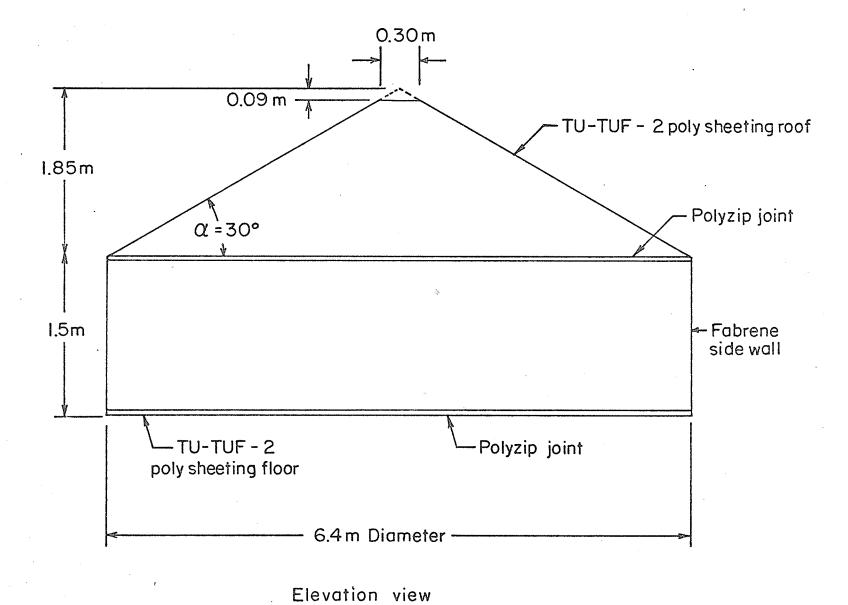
Cylindrical bin with monolithic wall and conical roof.
